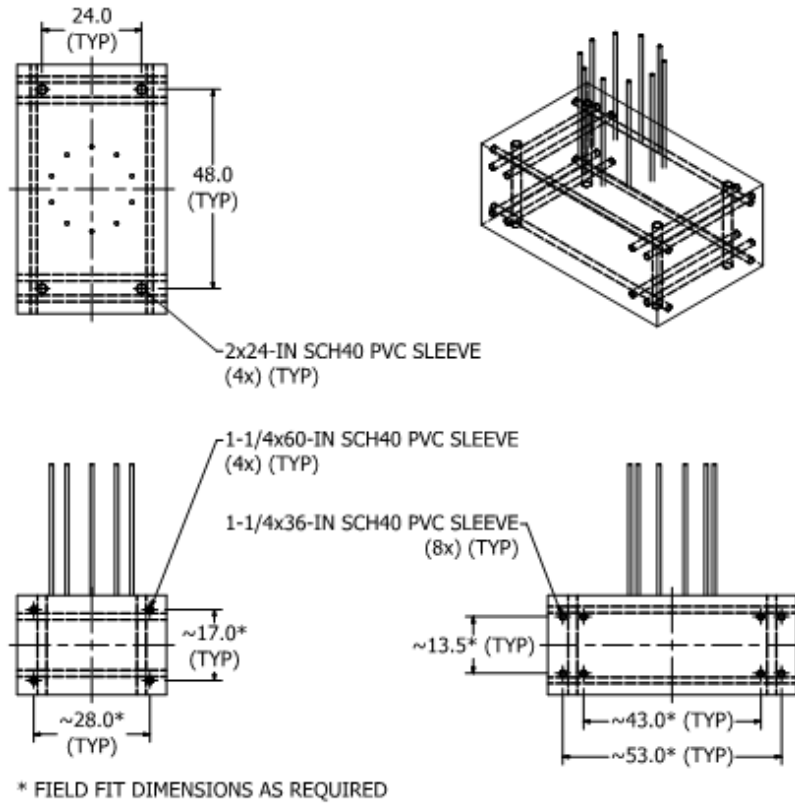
Footing Sleeve Details (10-#7 Starter Bars Depicted) (Dimension in Inches)
